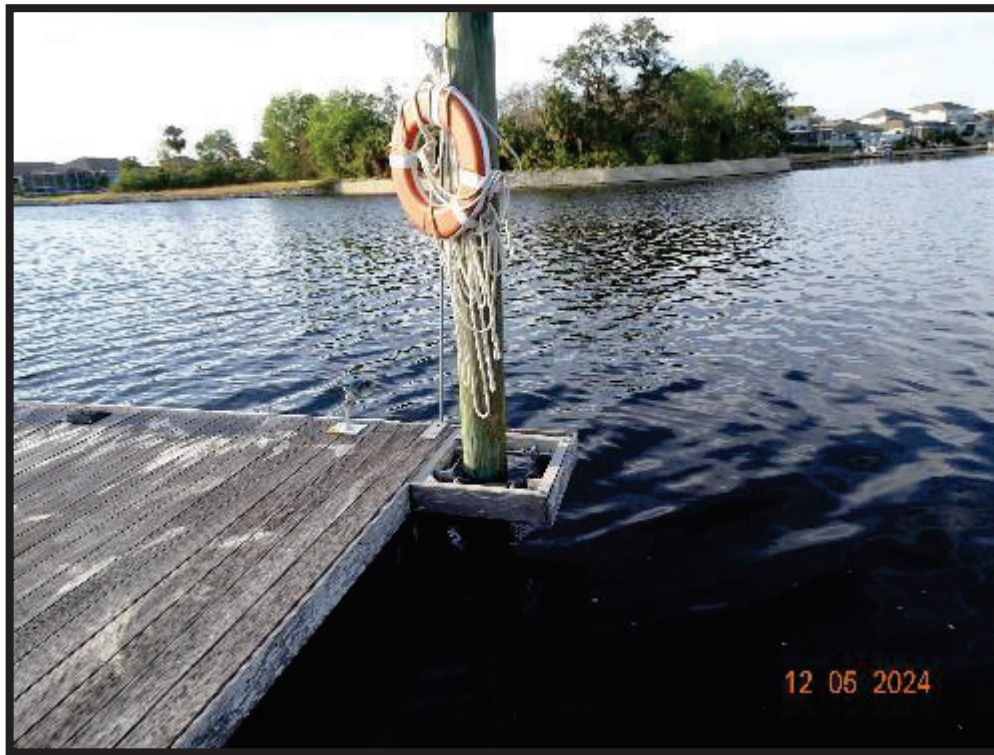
View of timber pile through a roller pile guide with missing rubber rollers.
